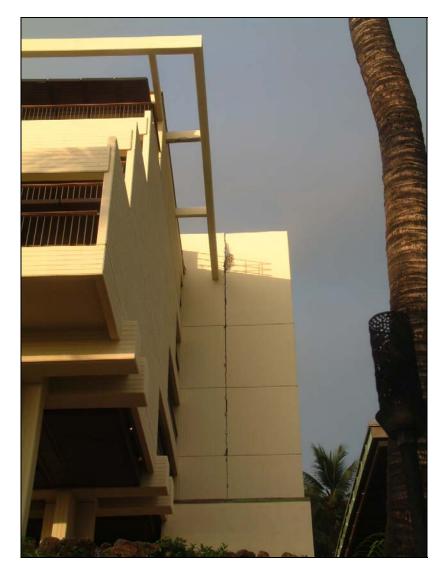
Damage to concrete exhaust flume at connector plate – west side. (Photograph by Gary Chock)
